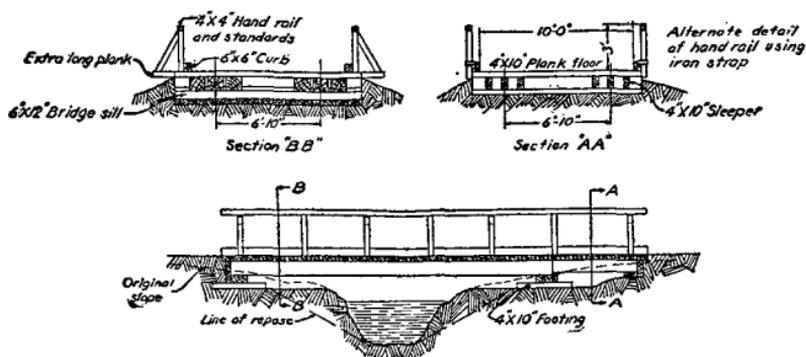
Typical design of stringer bridge showing alternate arrangement of the abutments
